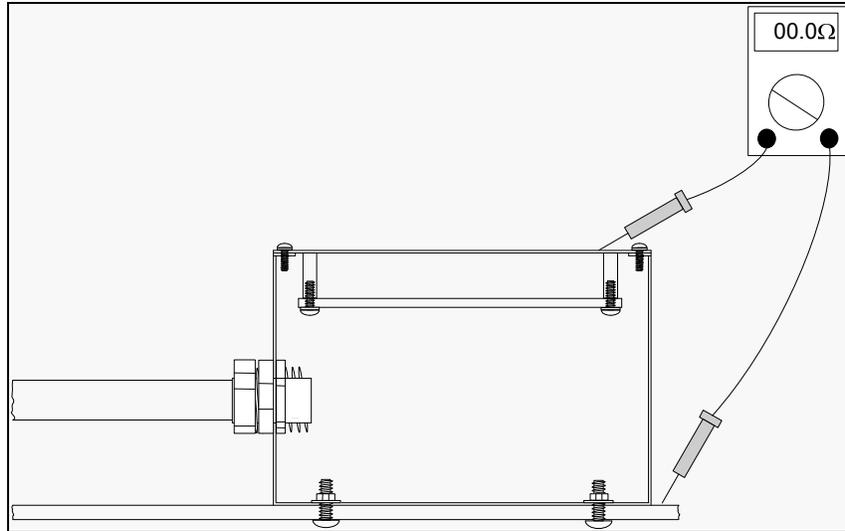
Continuity Testing - Mounting Surface to Faceplate
